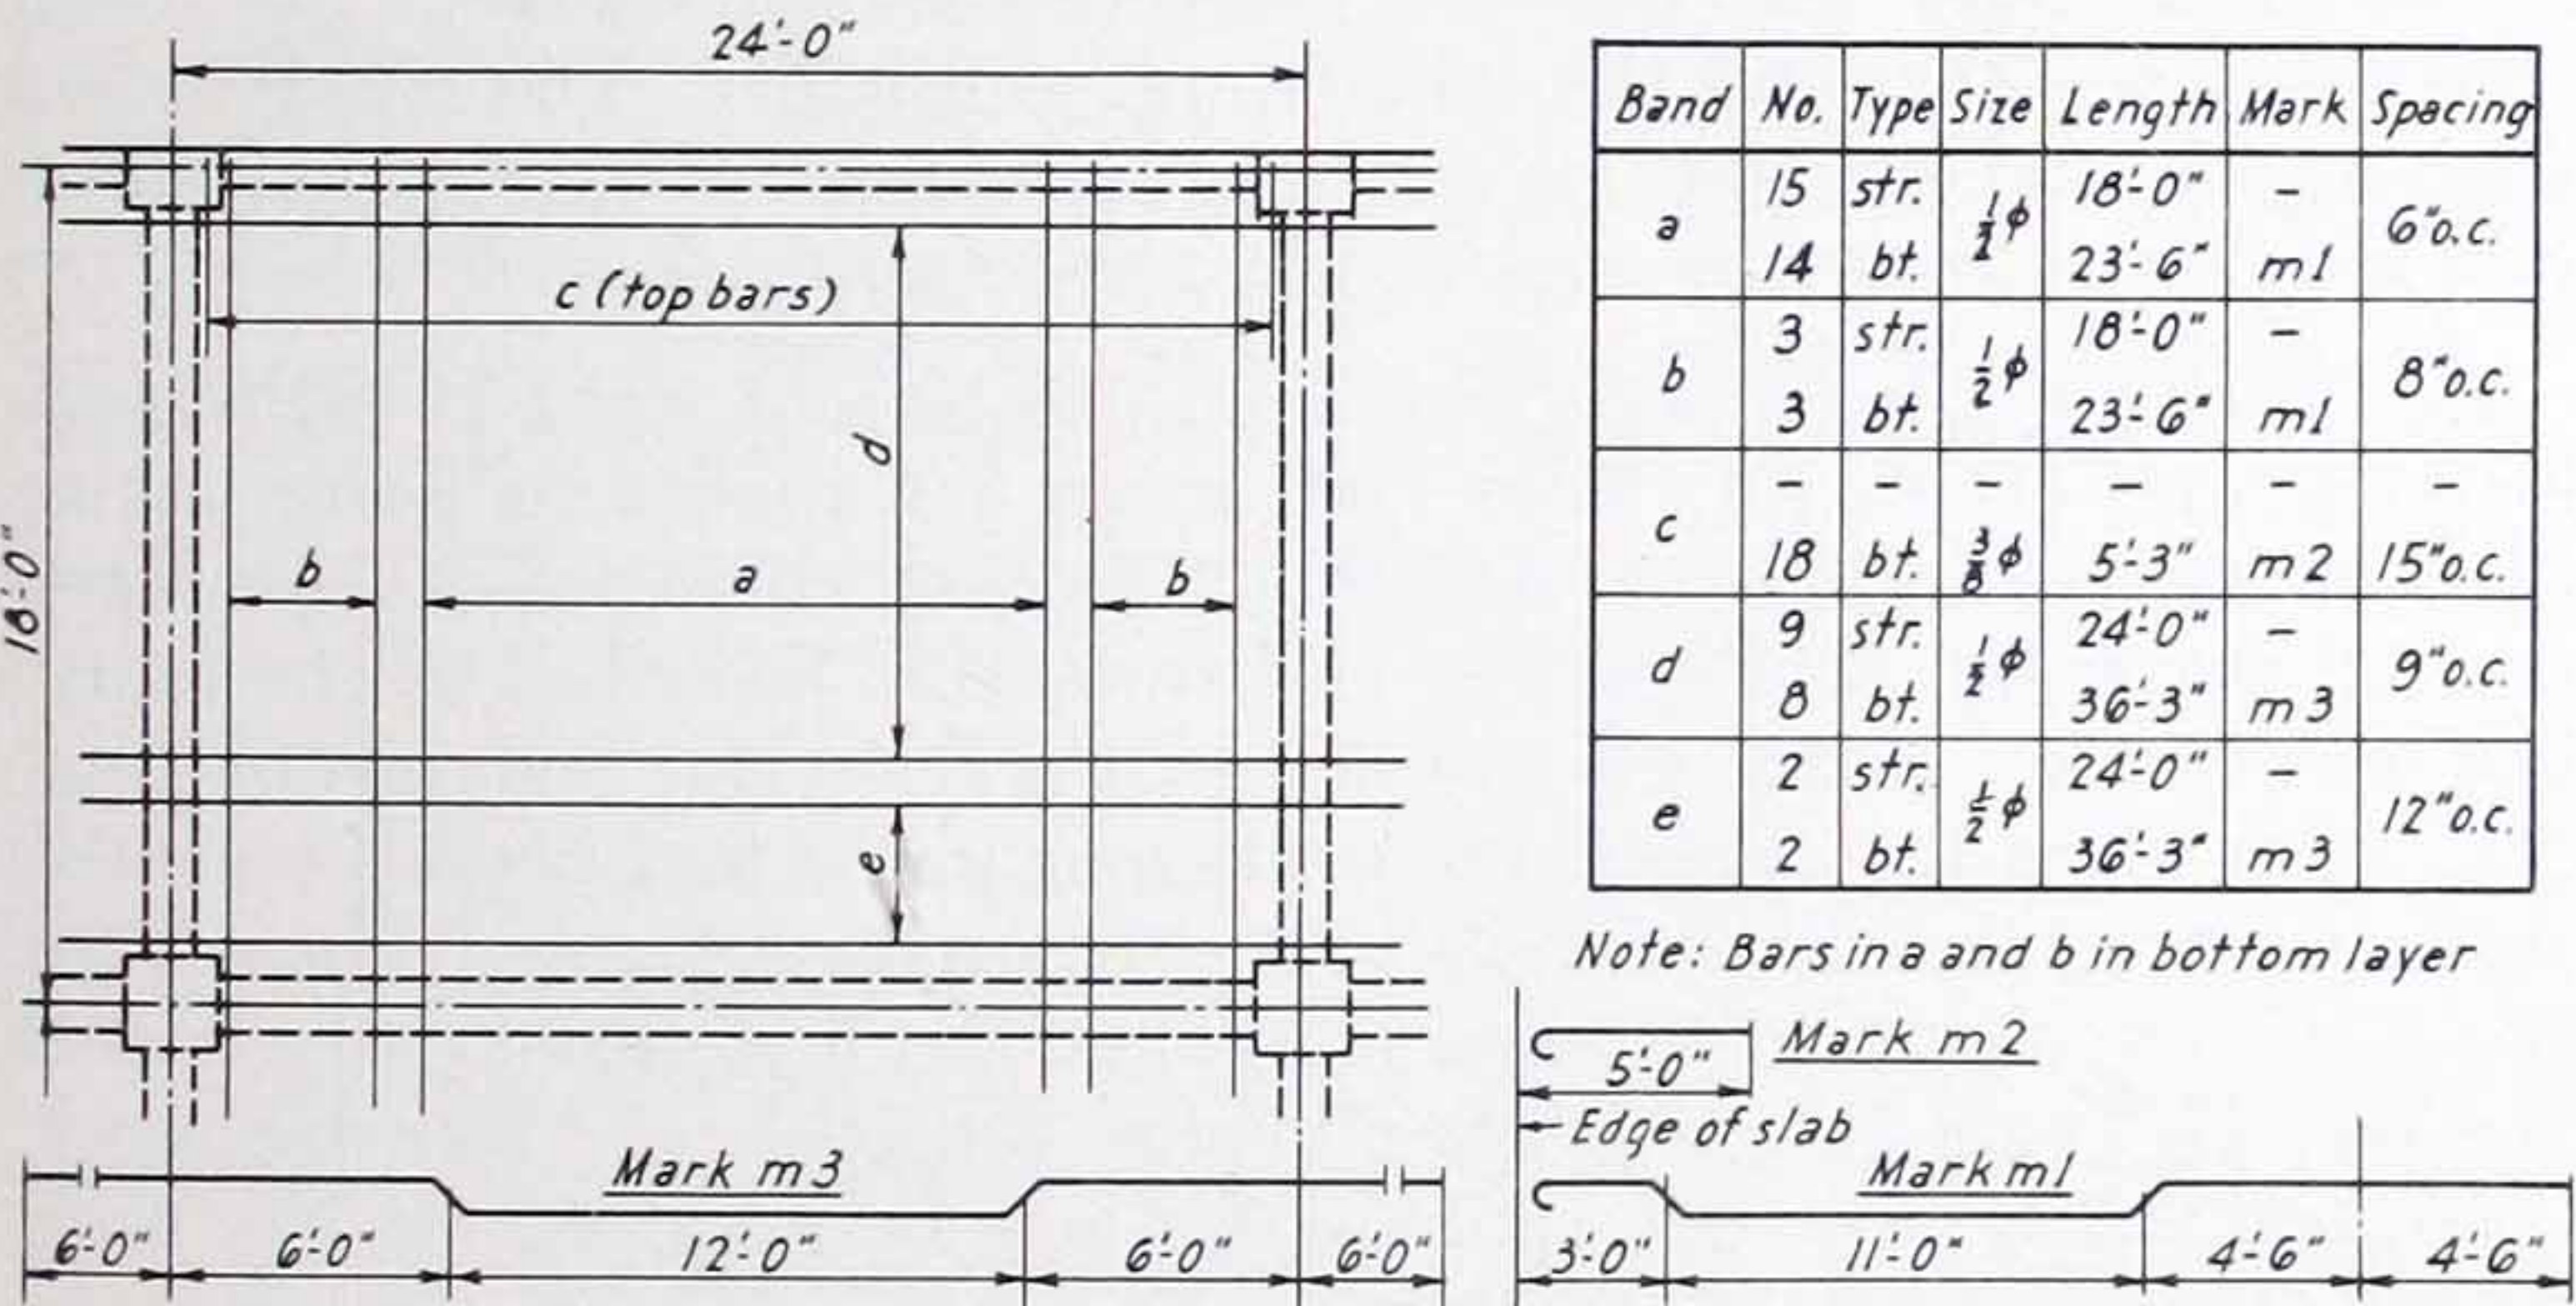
PART FRAMING PLAN AND BAR SCHEDULE
